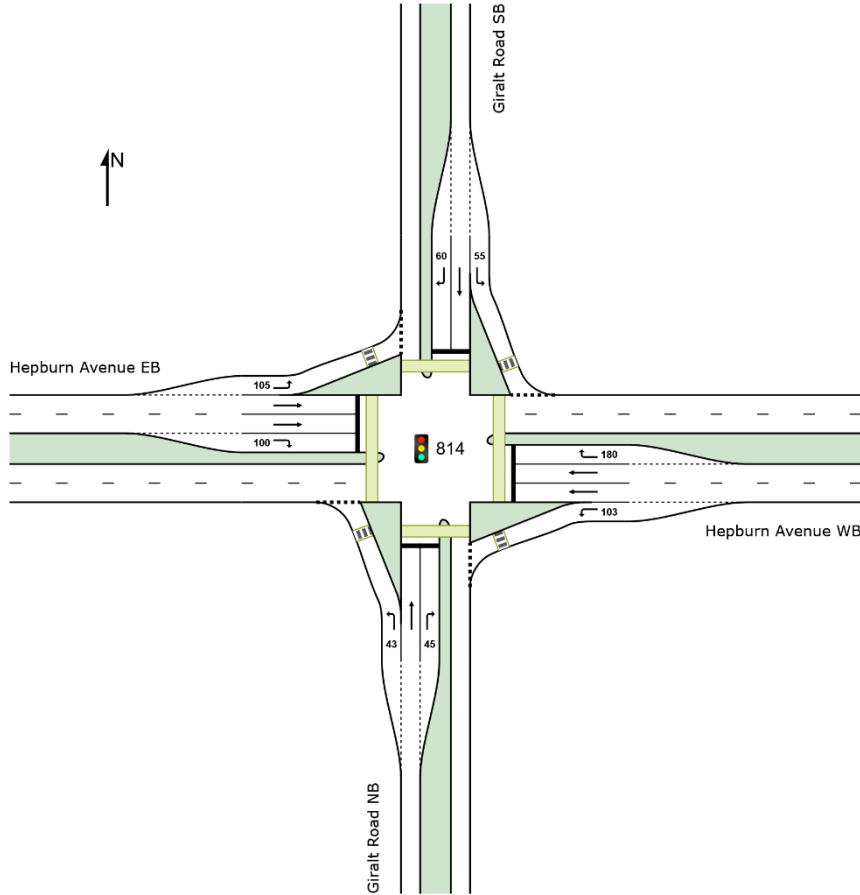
Hepburn Avenue / Giralt Road / Kingsway east access - layout and signal phasing
